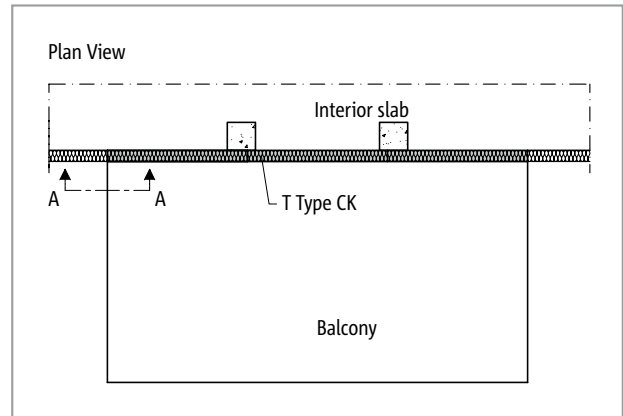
Schöck Isokorb® T Type CK: Location of section A-A
